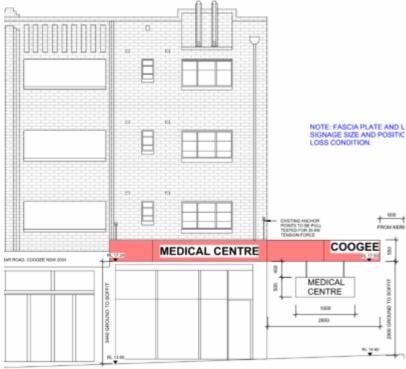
The proposed elevation along the Coogee Bay Road frontage
